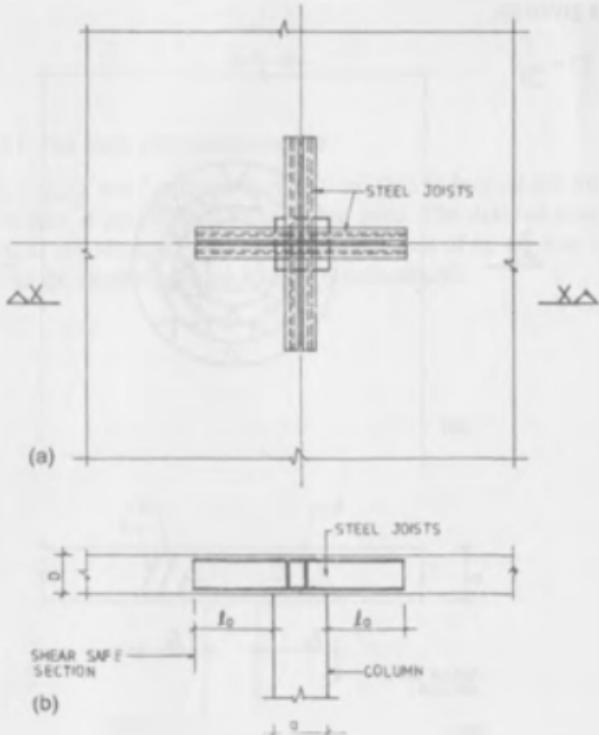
Flat plate system with structural steel shear head (without column capital). (a) Plan; (b) Section X-X.
